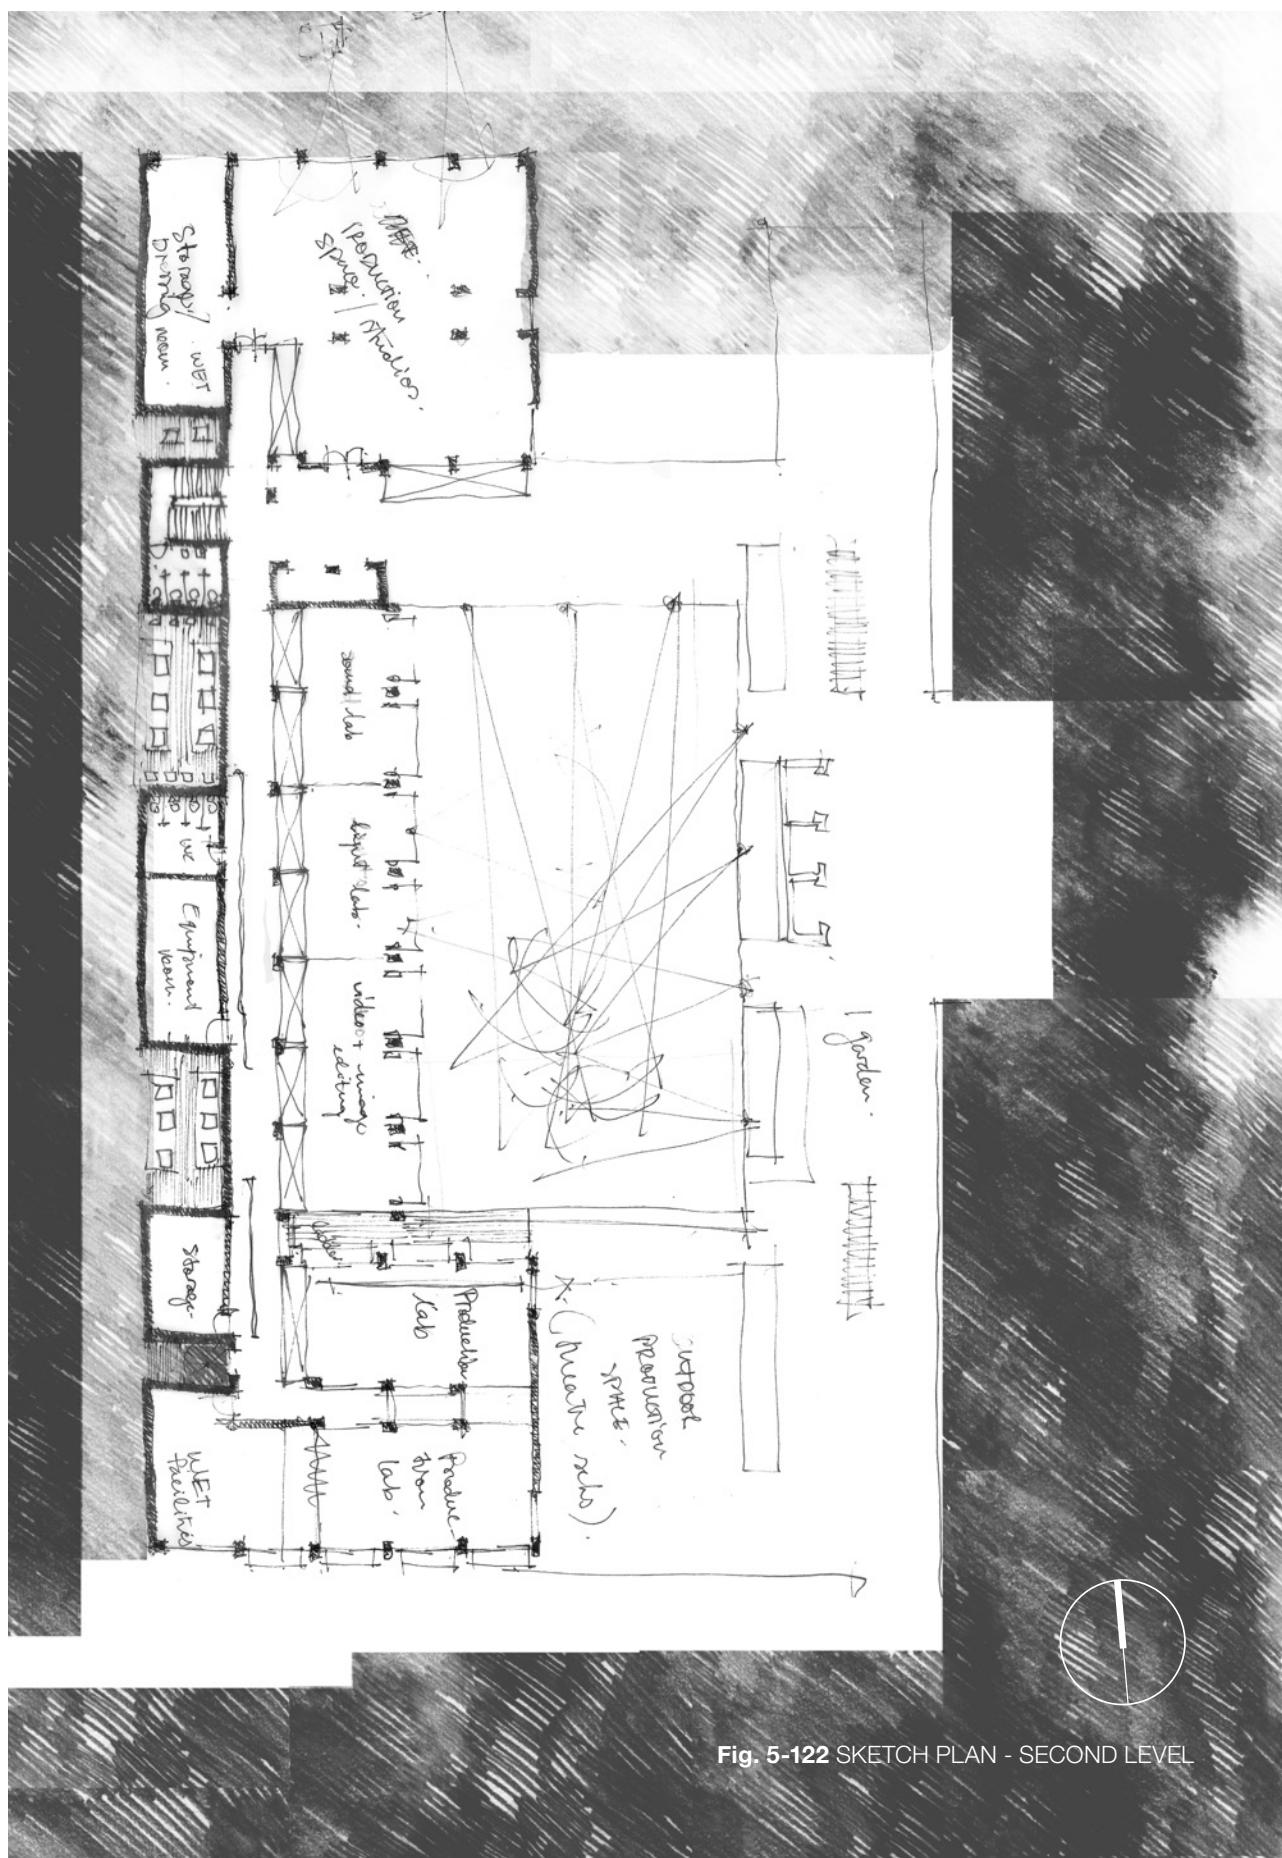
SKETCH PLAN - SECOND LEVEL
